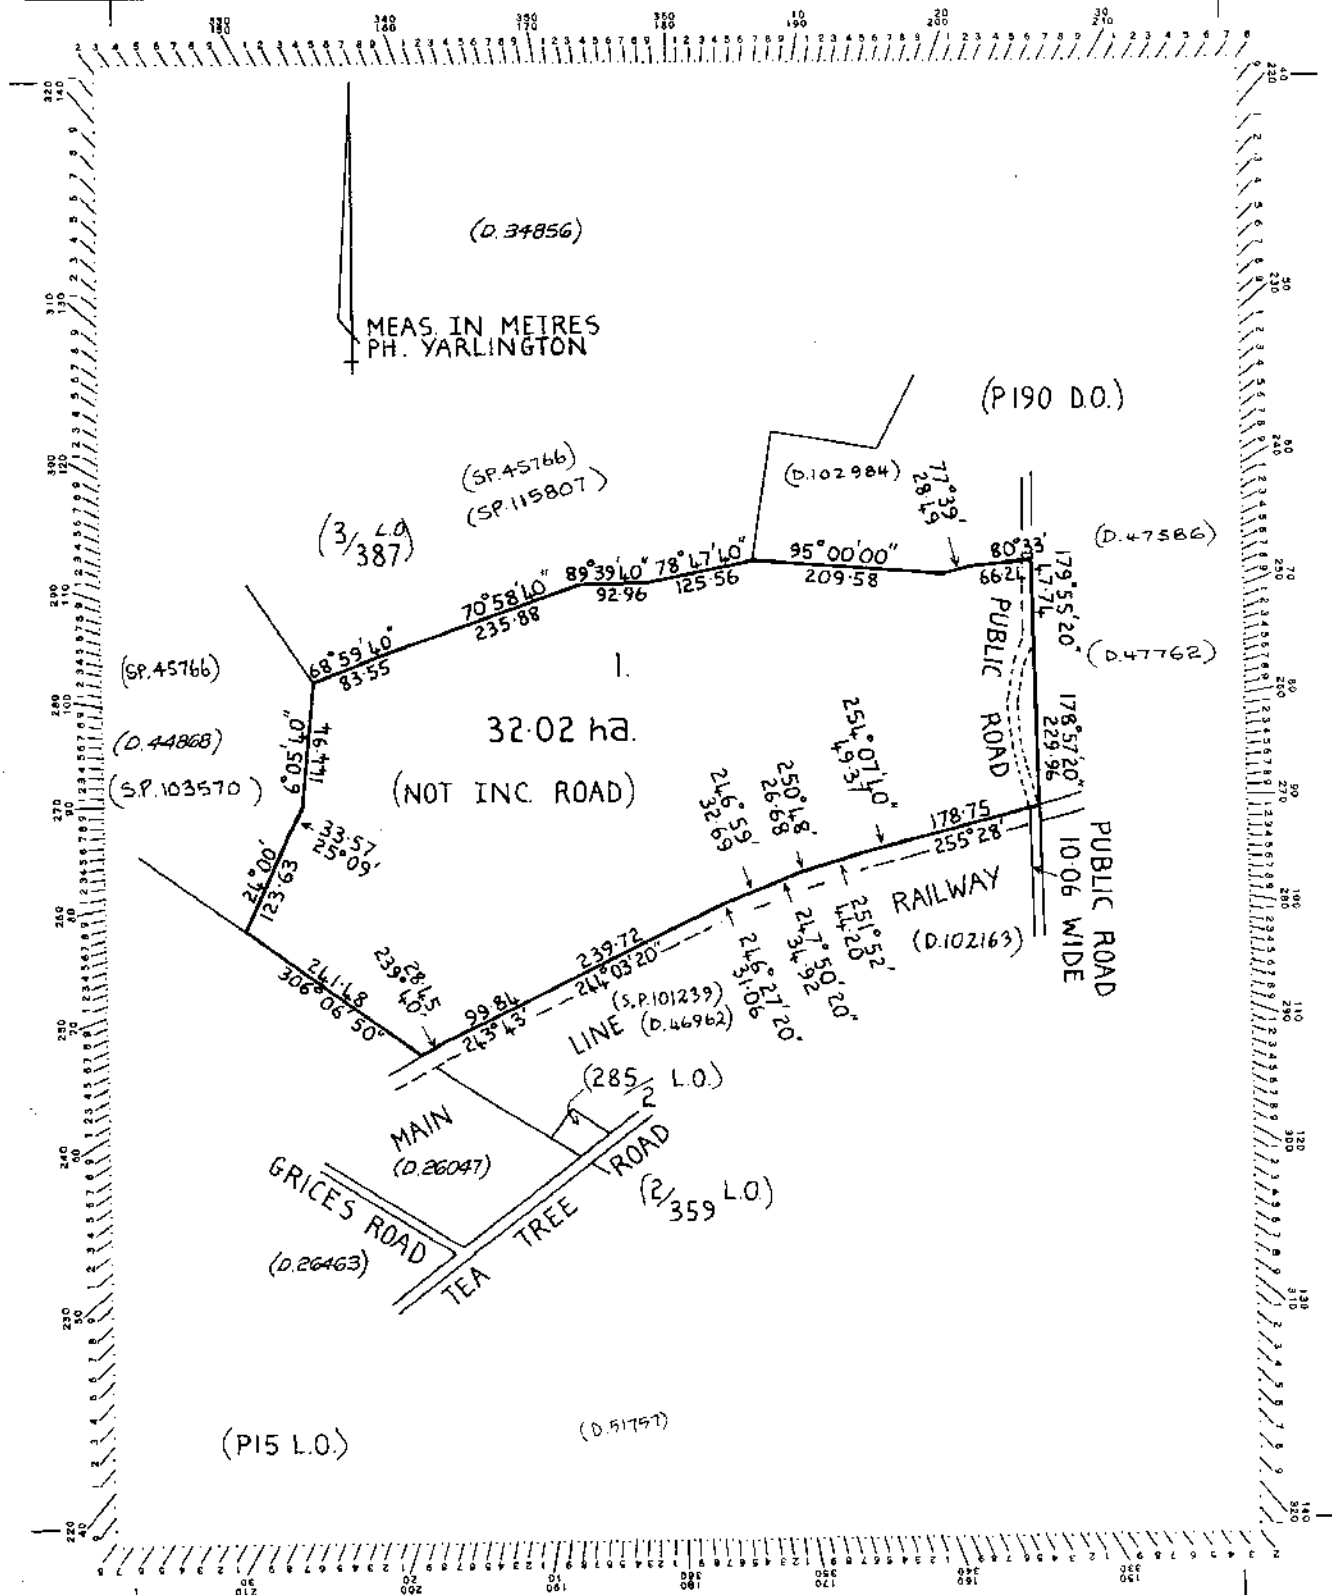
Enlarged site plan (source bardraft design, drawing no A-03)
